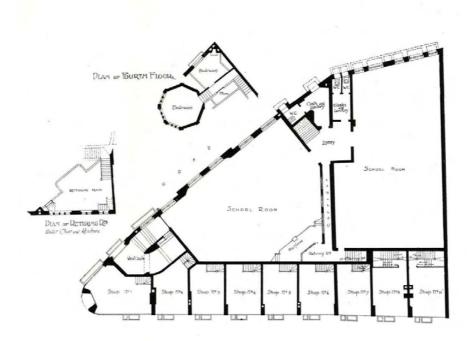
Ground floor plan of Westgate Hall in Newcastle by Crouch and Butler (1900). Source: Crouch and Butler (1901).
